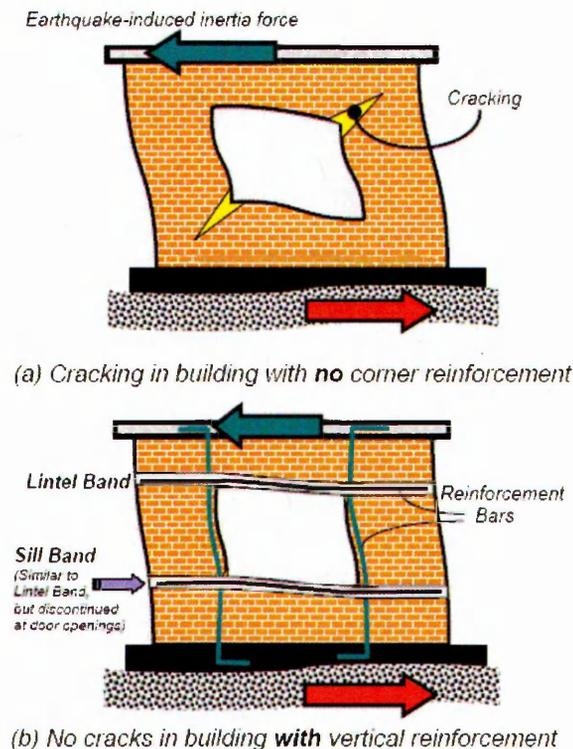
Cracks at corners of openings in a masonry building – reinforcement around them helps (IITK-BMTPC, 2003)
